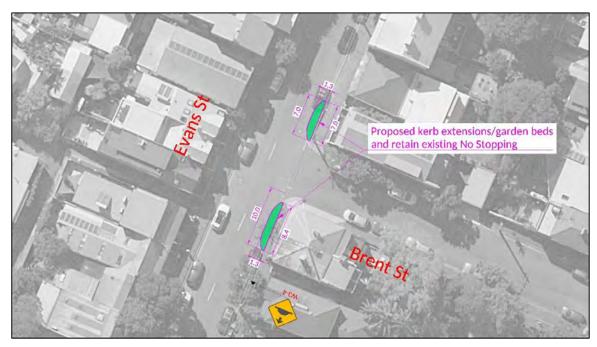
Evans Street/ Brent Street intersection proposal.
